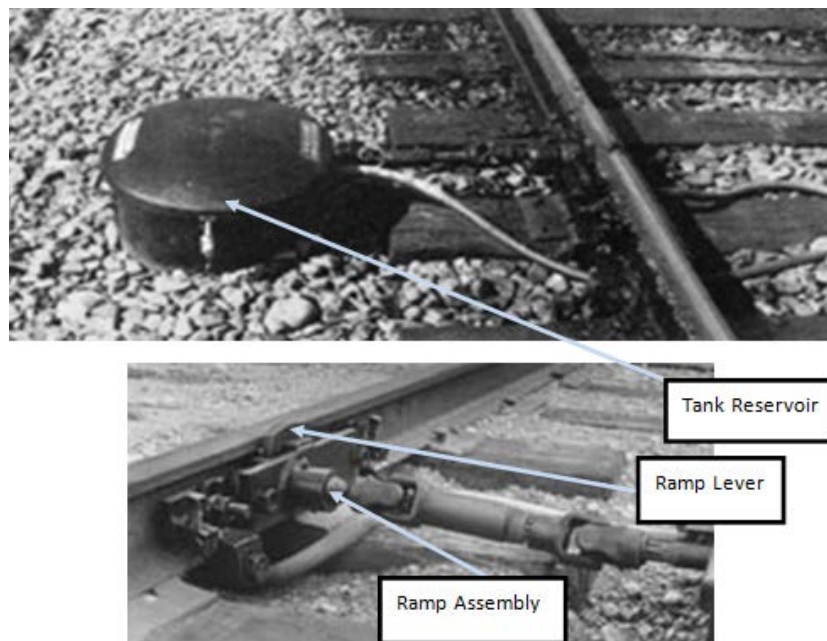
Mechanical lubricator (www.portecrail.com)
